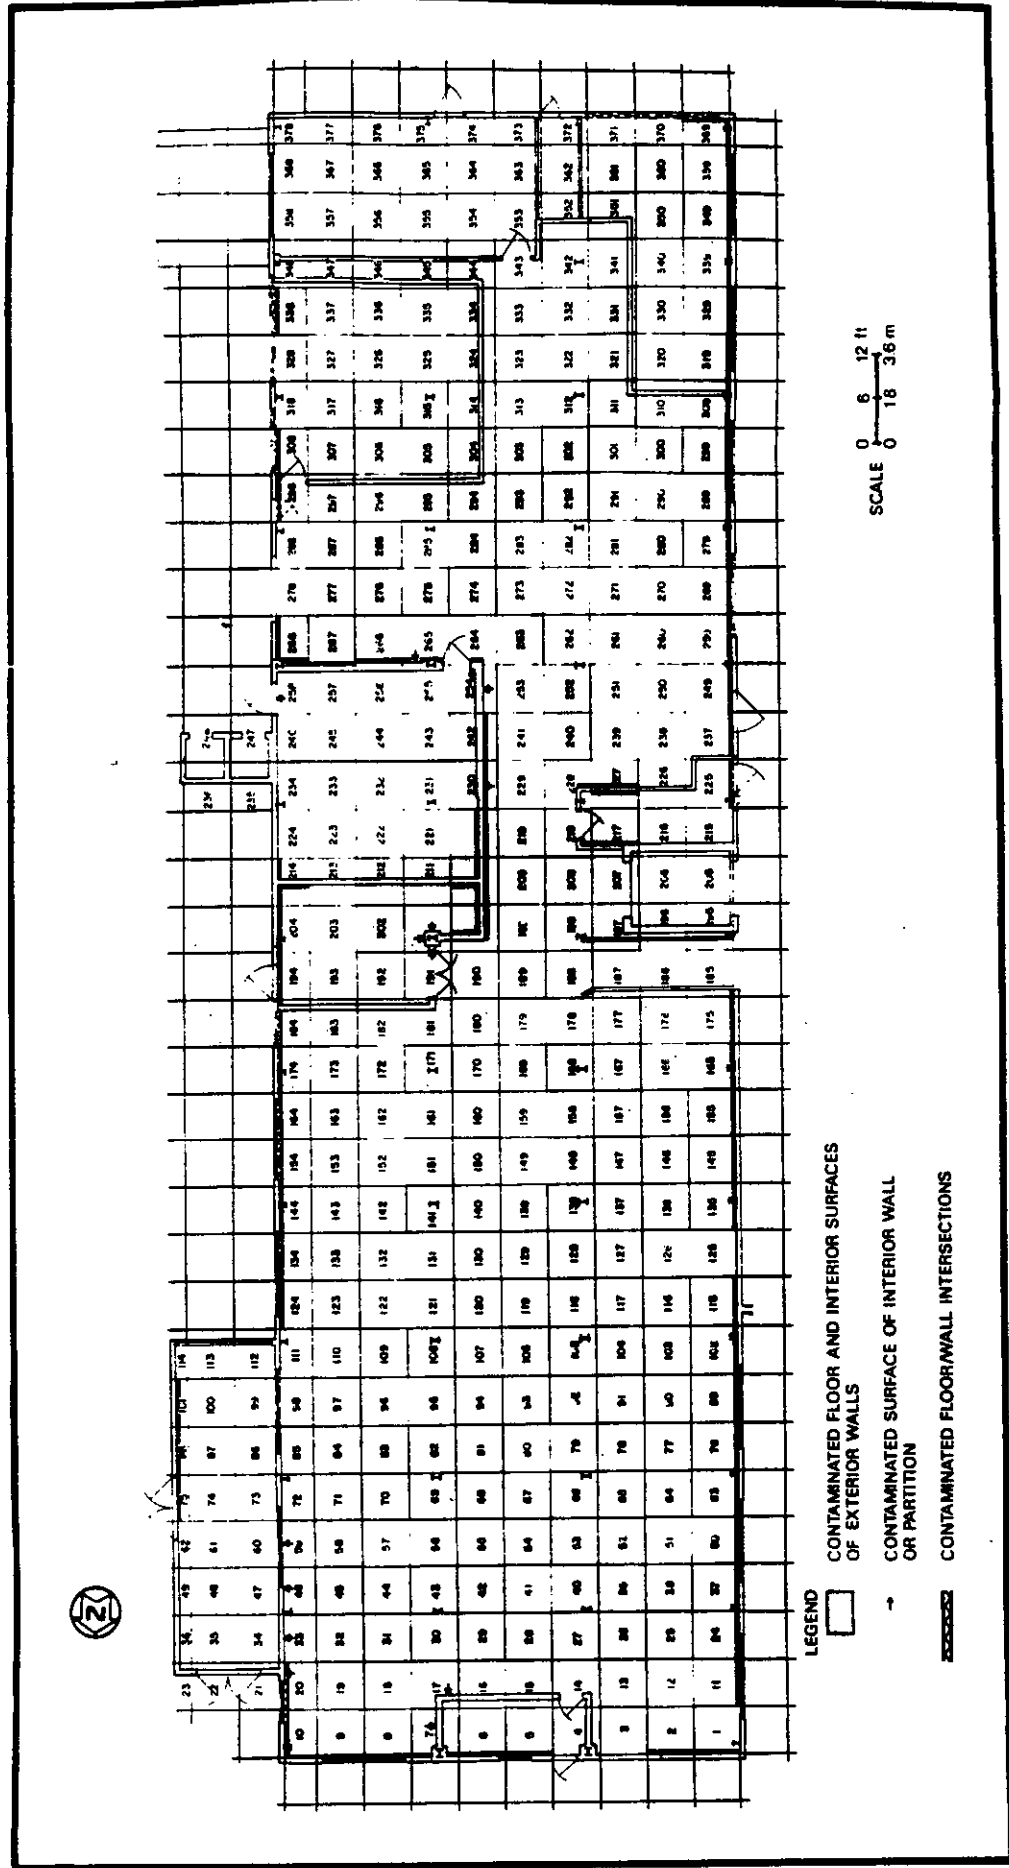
BUILDING 845, FIRST FLOOR: AREAS OF SURFACE CONTAMINATION ON FLOOR, WALLS, AND FLOOR/WALL INTERSECTIONS
